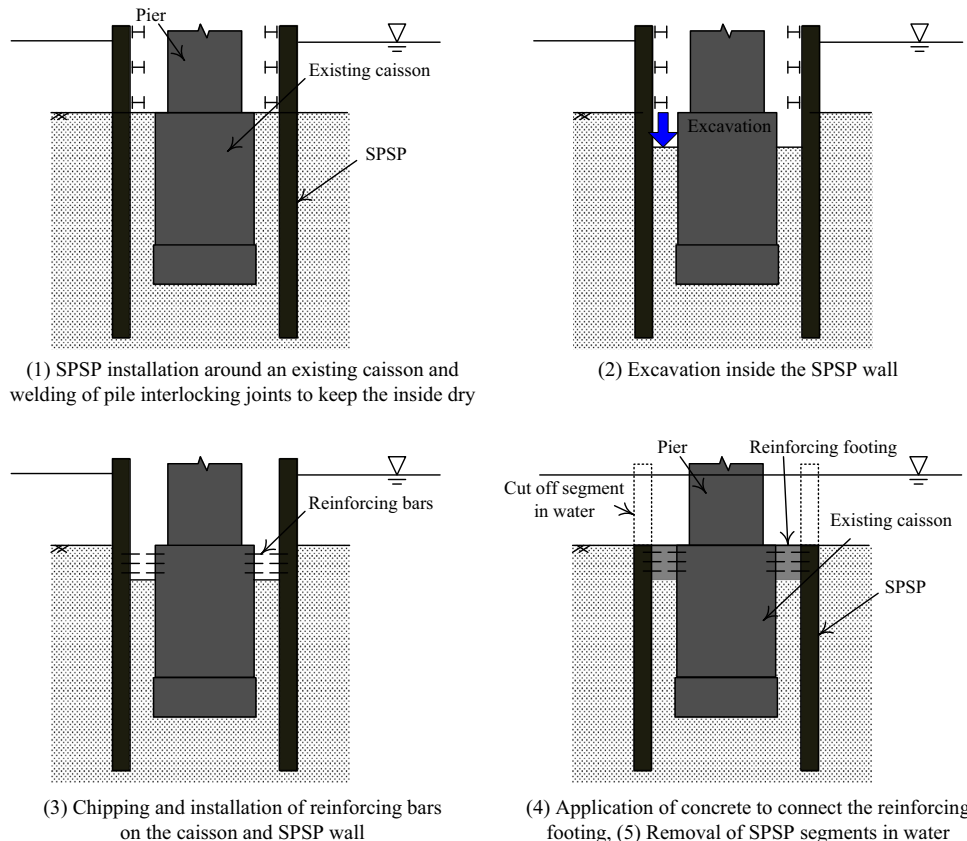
Construction flow of the SPSP reinforcement method. (1) SPSP installation around an existing caisson and welding of pile interlocking joints to keep the inside dry; (2) excavation inside the SPSP wall; (3) chipping and installation of reinforcing bars on the caisson and SPSP wall; (4) application of concrete to connect the reinforcing footing; and (5) removal of SPSP segments in water.
